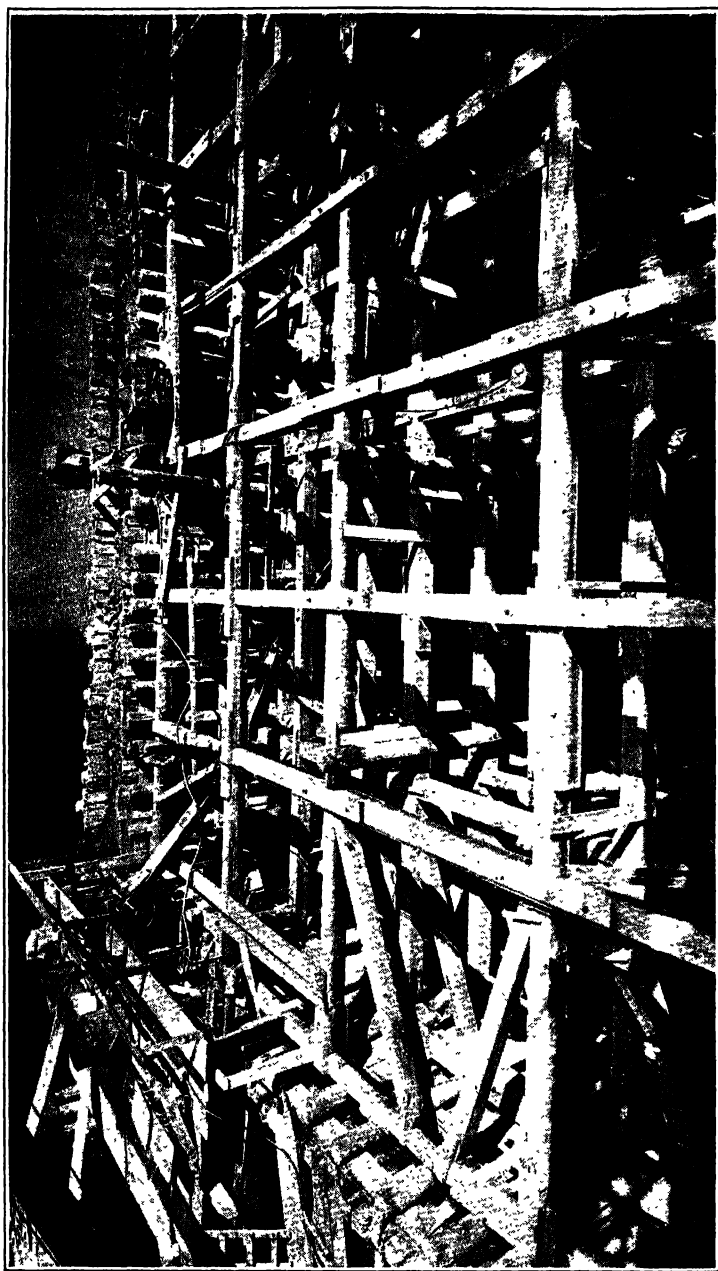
A well braced cofferdam with puddle wall using wooden sheet piling for both walls.
